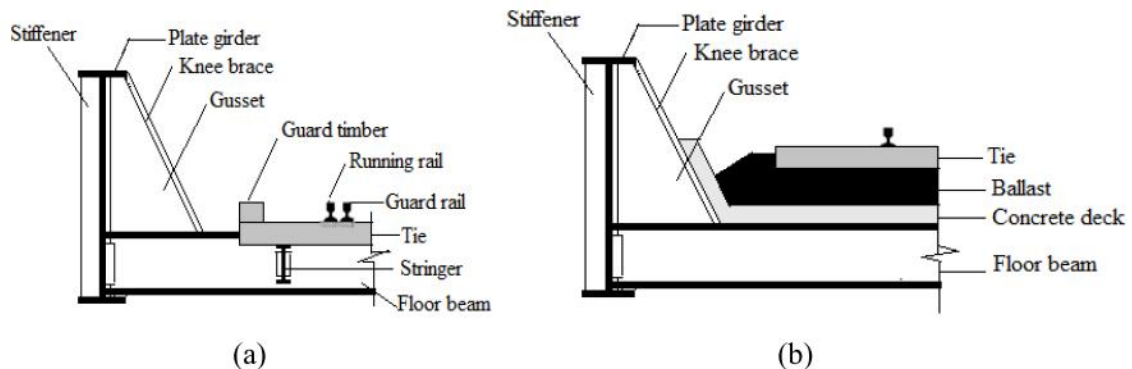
(a) Open-deck through-plate girder (b) Ballasted-deck through-plate girder. (source: Robert Benaim, [19].)
